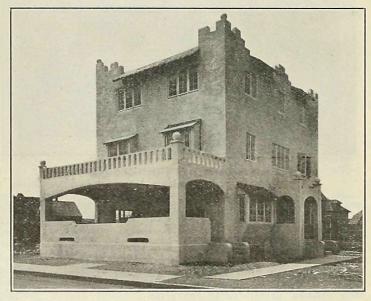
SHOWING COMPLETED RESIDENCE OCCUPIED BY OWNER. IDENTICAL WALLS WERE USED IN RECONSTRUCTION.
